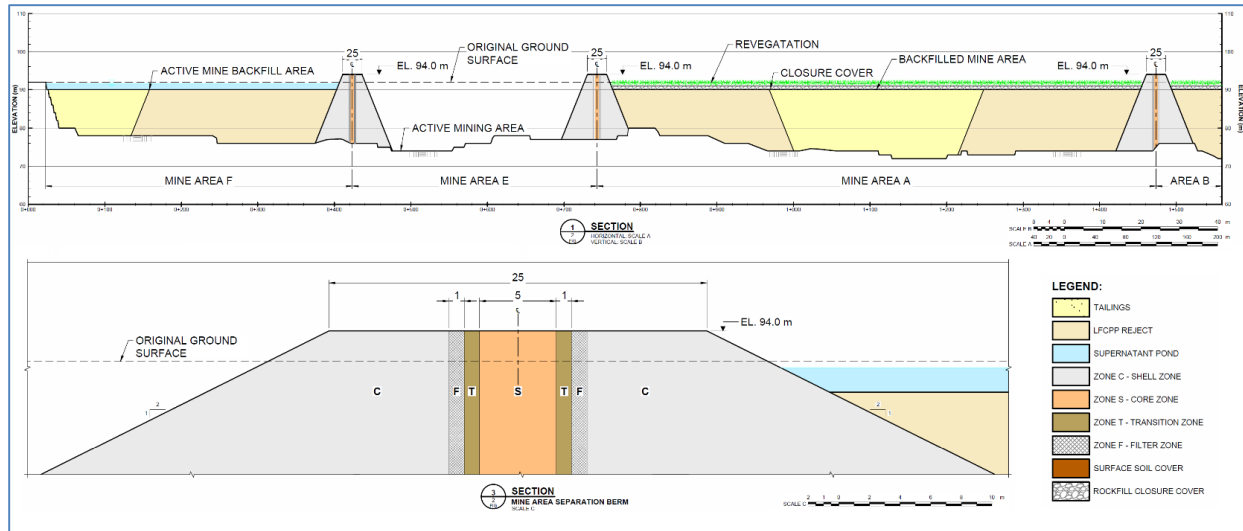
Mine Area Backfilling Cross-Section Source: (KP, 2019)
